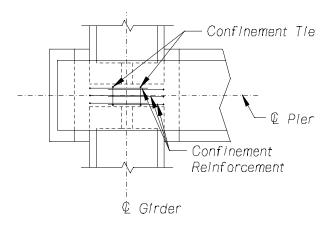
Plan View Showing Confinement Reinforcement in Pier Diaphragms
